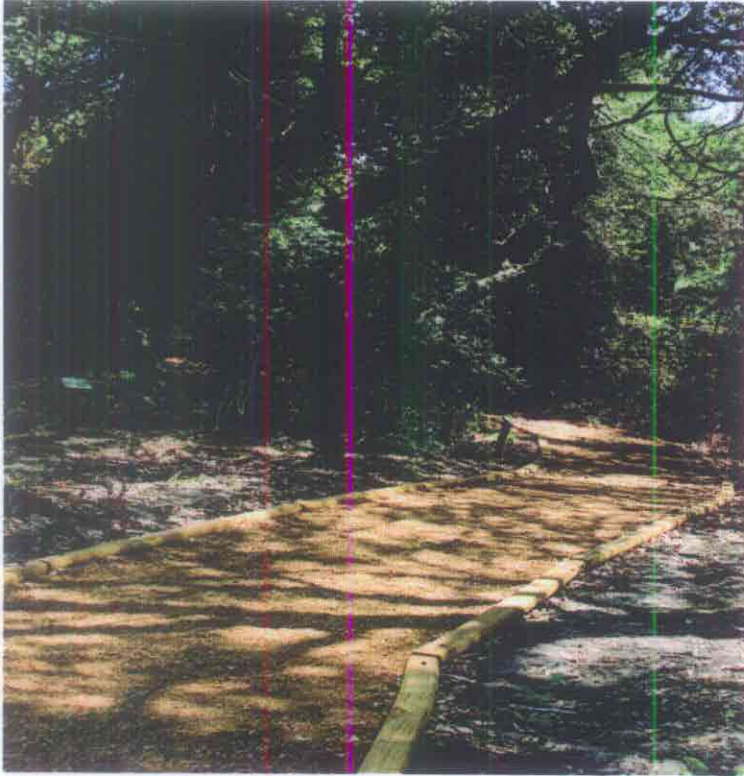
ADA-approved trails with crushed granite base and viewing bulbouts were constructed in 2009.
